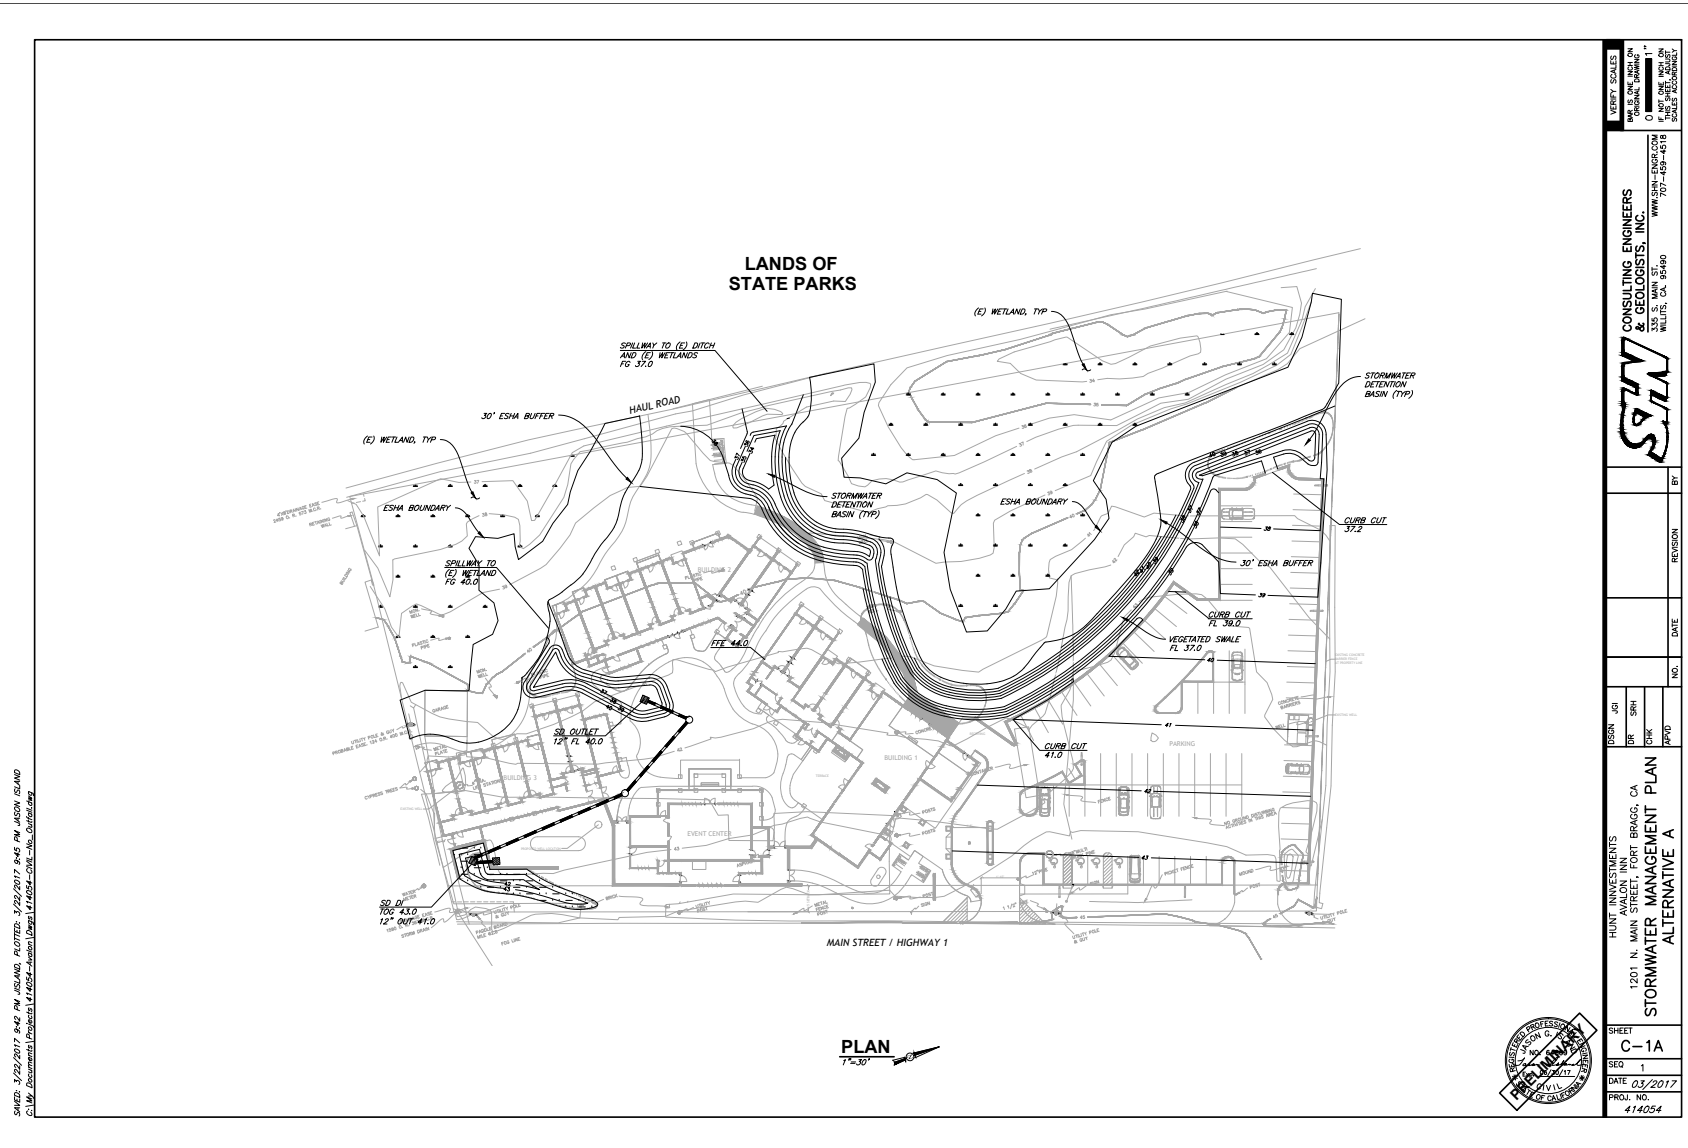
SHN Stormwater Management Plan, 2017.03, Sheet C-1A, on-site drainage [Alternative B for the purpose of this analysis].
